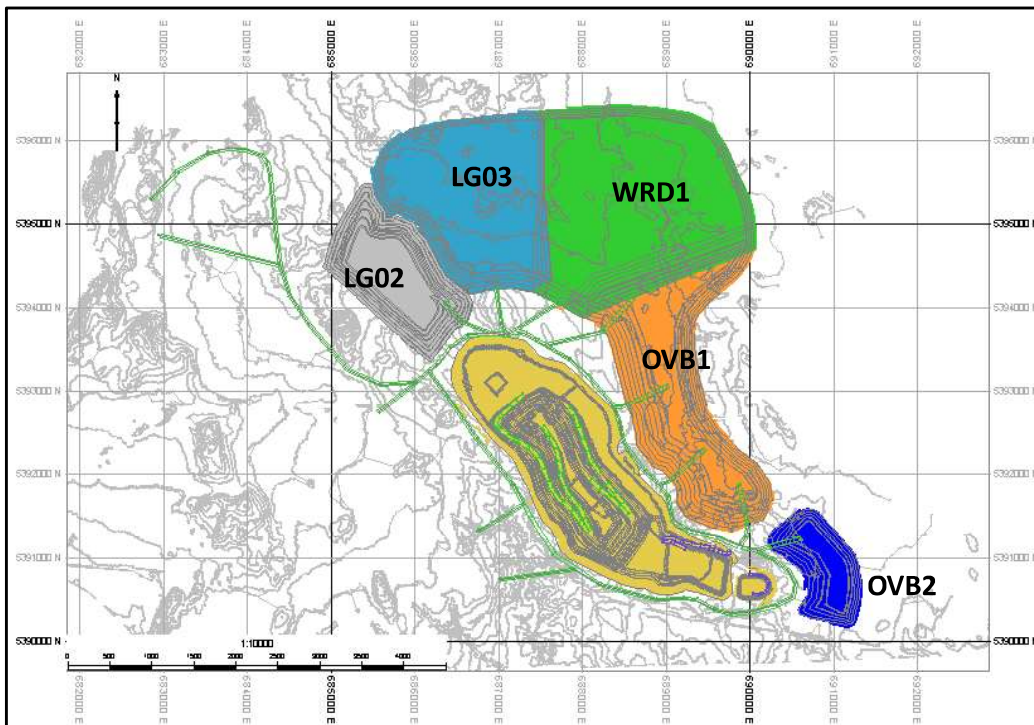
Layout of Dumps & Stockpiles – Year 15
